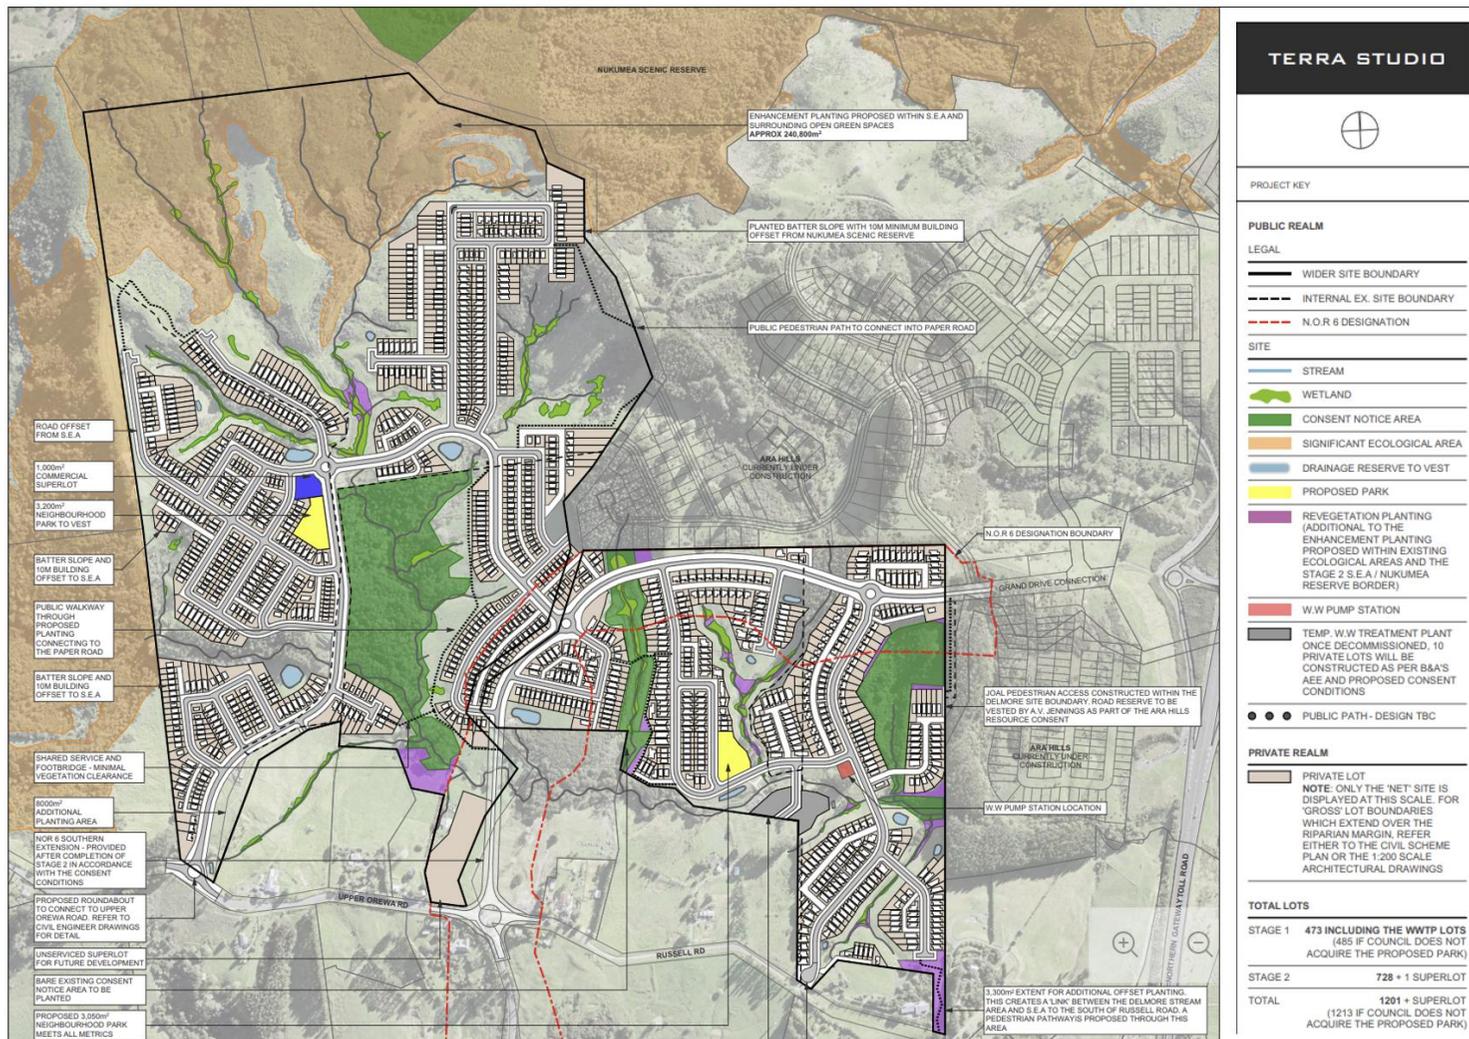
Scheme plan of the proposed development (source: Terra Studios)
